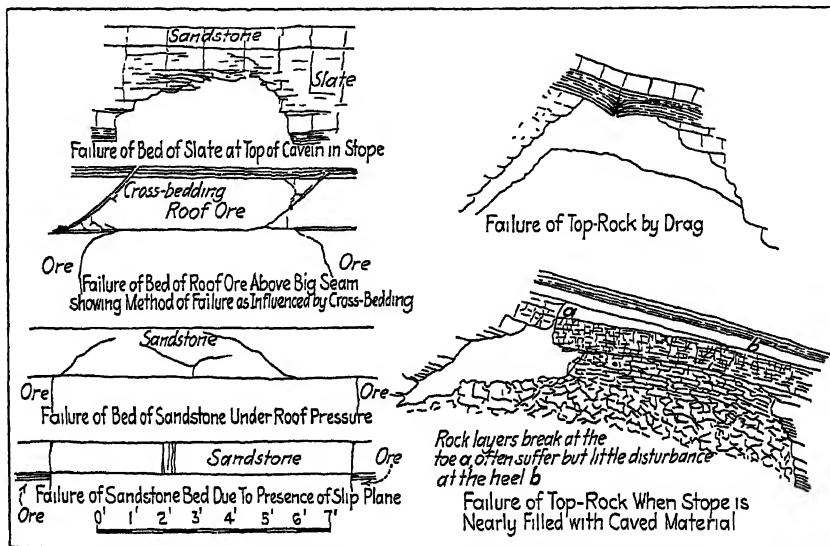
EXAMPLES OF FAILURE OF TOP ROCK IN MINE WORKINGS.
